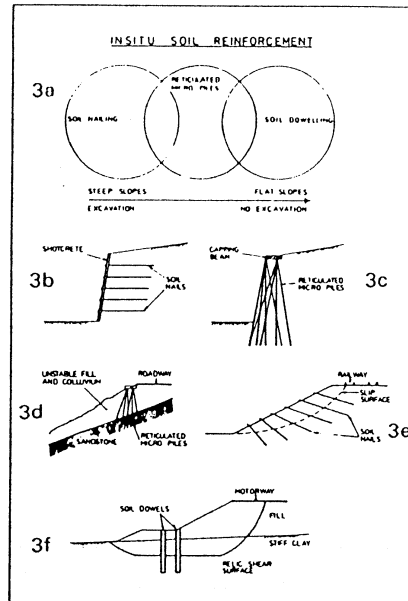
Overlap of insitu soil reinforcement applications (b) and (c) in excavations, (d) and (e) for general slope stabilisation and (f) to stabilise residual slips in clay
